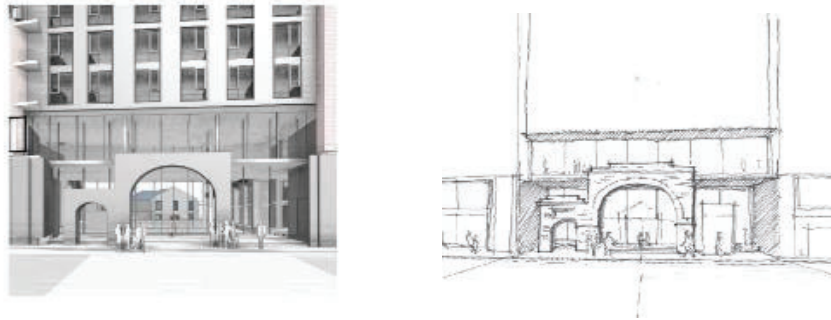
Early Design Elevations around the Stone Gateway Arch
